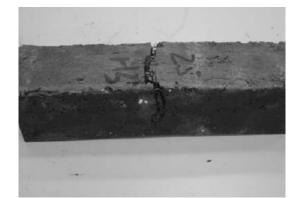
Photo prism UHPC2.5 after flexural test of crack extension and failure
